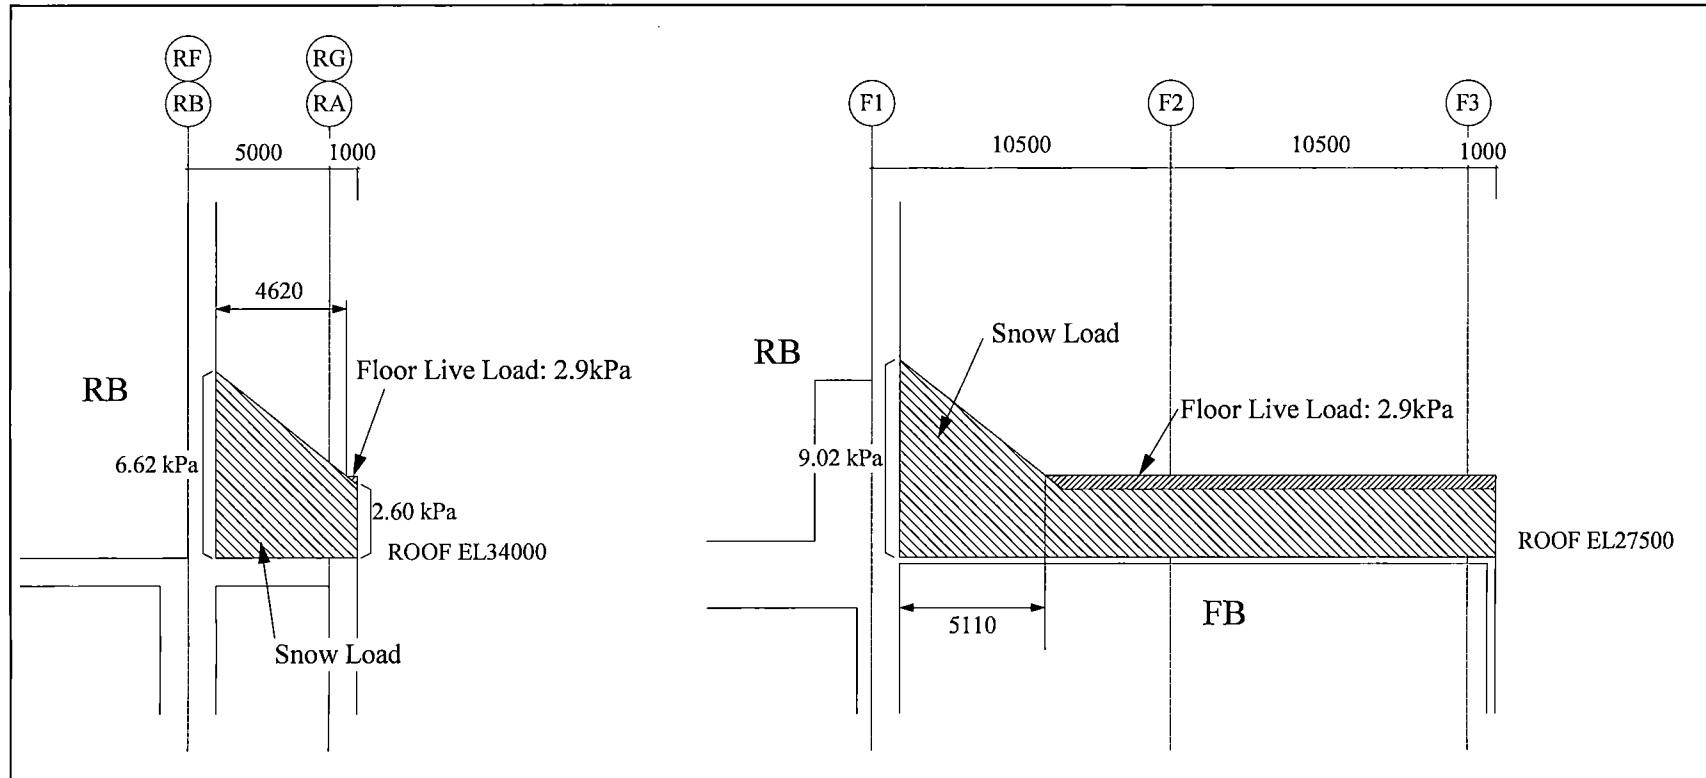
Floor Live Load Enveloped Snow Drift Load for Lower Roofs
